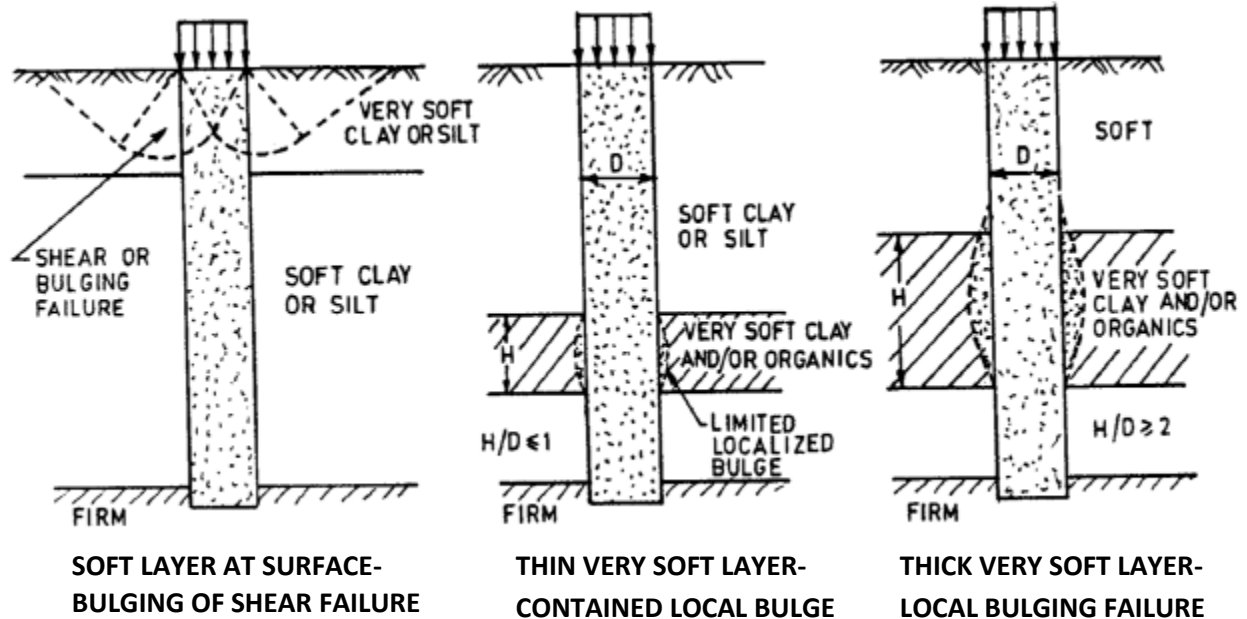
Failure mechanism of single stone column in a non-homogenous soft layer
